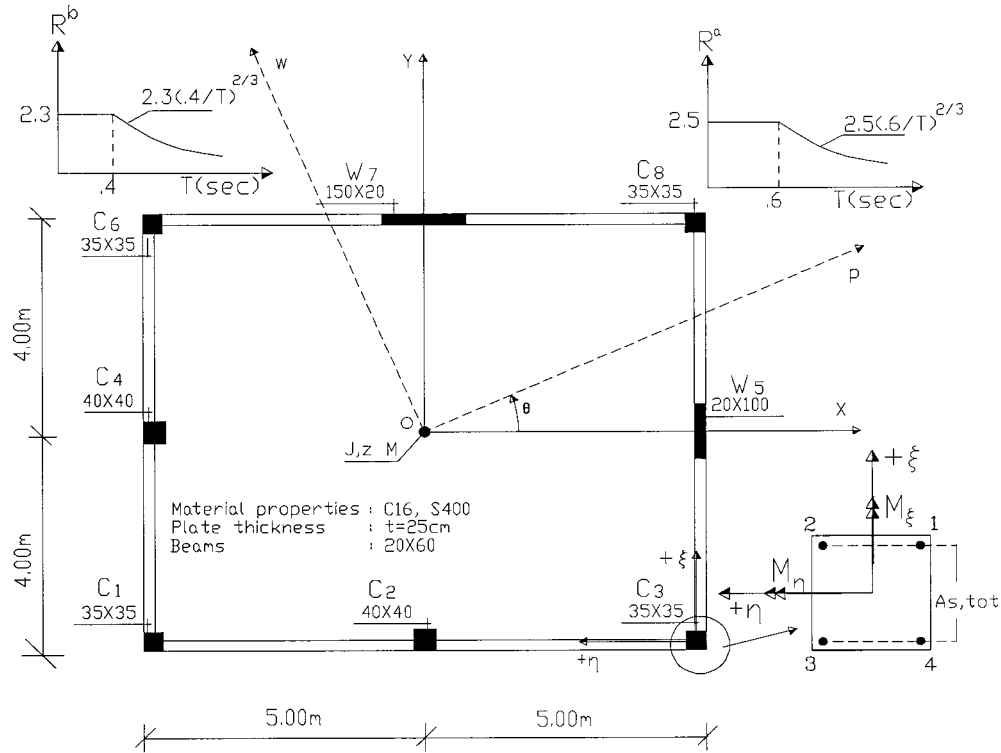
Typical floor plan of a 6-story building and design response spectra.
